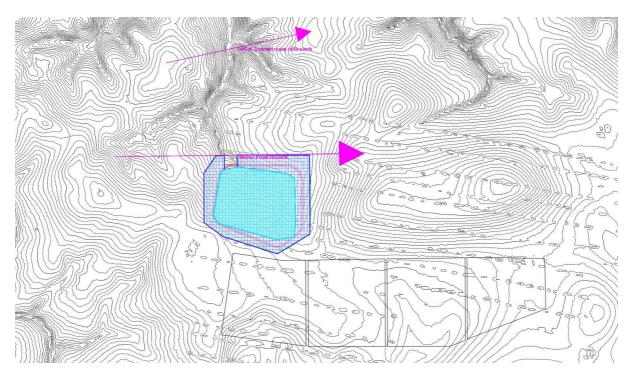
Scenario A - XPStorm WSD Dam Break Model Layout
